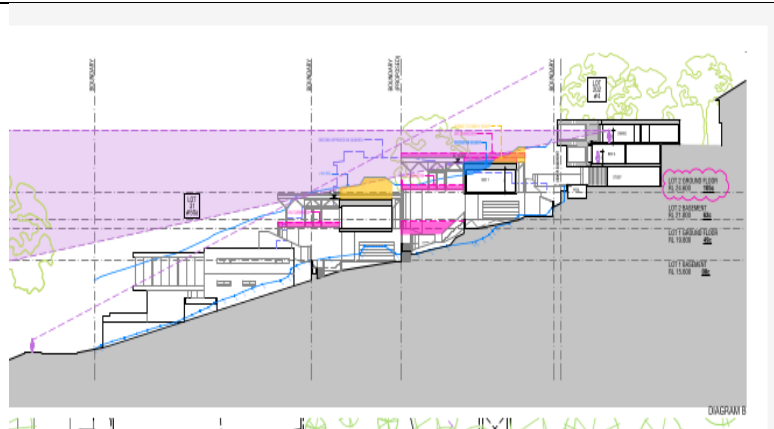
Facing North Elevation Showing No.4 Lindsay Place Second Floor View.
